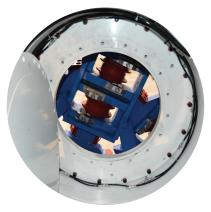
Photo of the periphery drive MTBM access door with back loaded tooling mounts.
